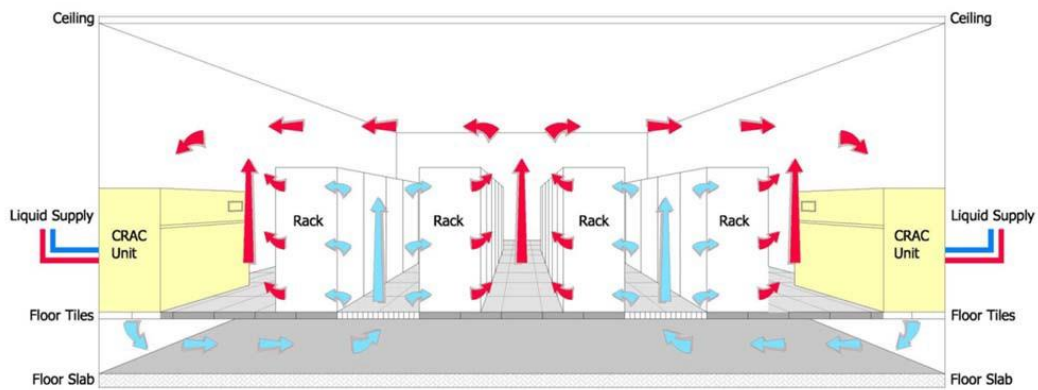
Traditional raised floor data center layout in cold aisle/hot aisle rack arrangement [10]
